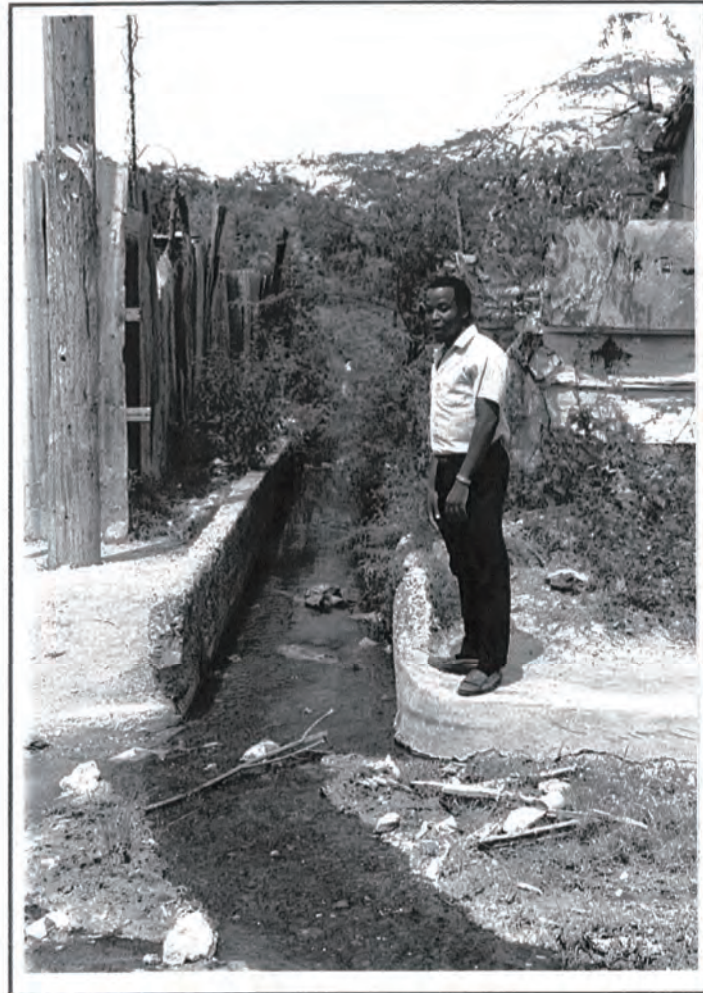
Plates 8, 9, 10; Sewage from sewer flows to the Duhaney, south of the New Haven pumping station.
